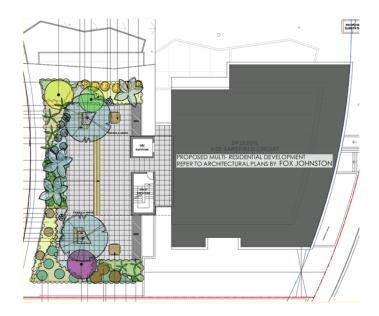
Rooftop Landscape Plan (ATC Landscape Architects) Showing Communal Rooftop
